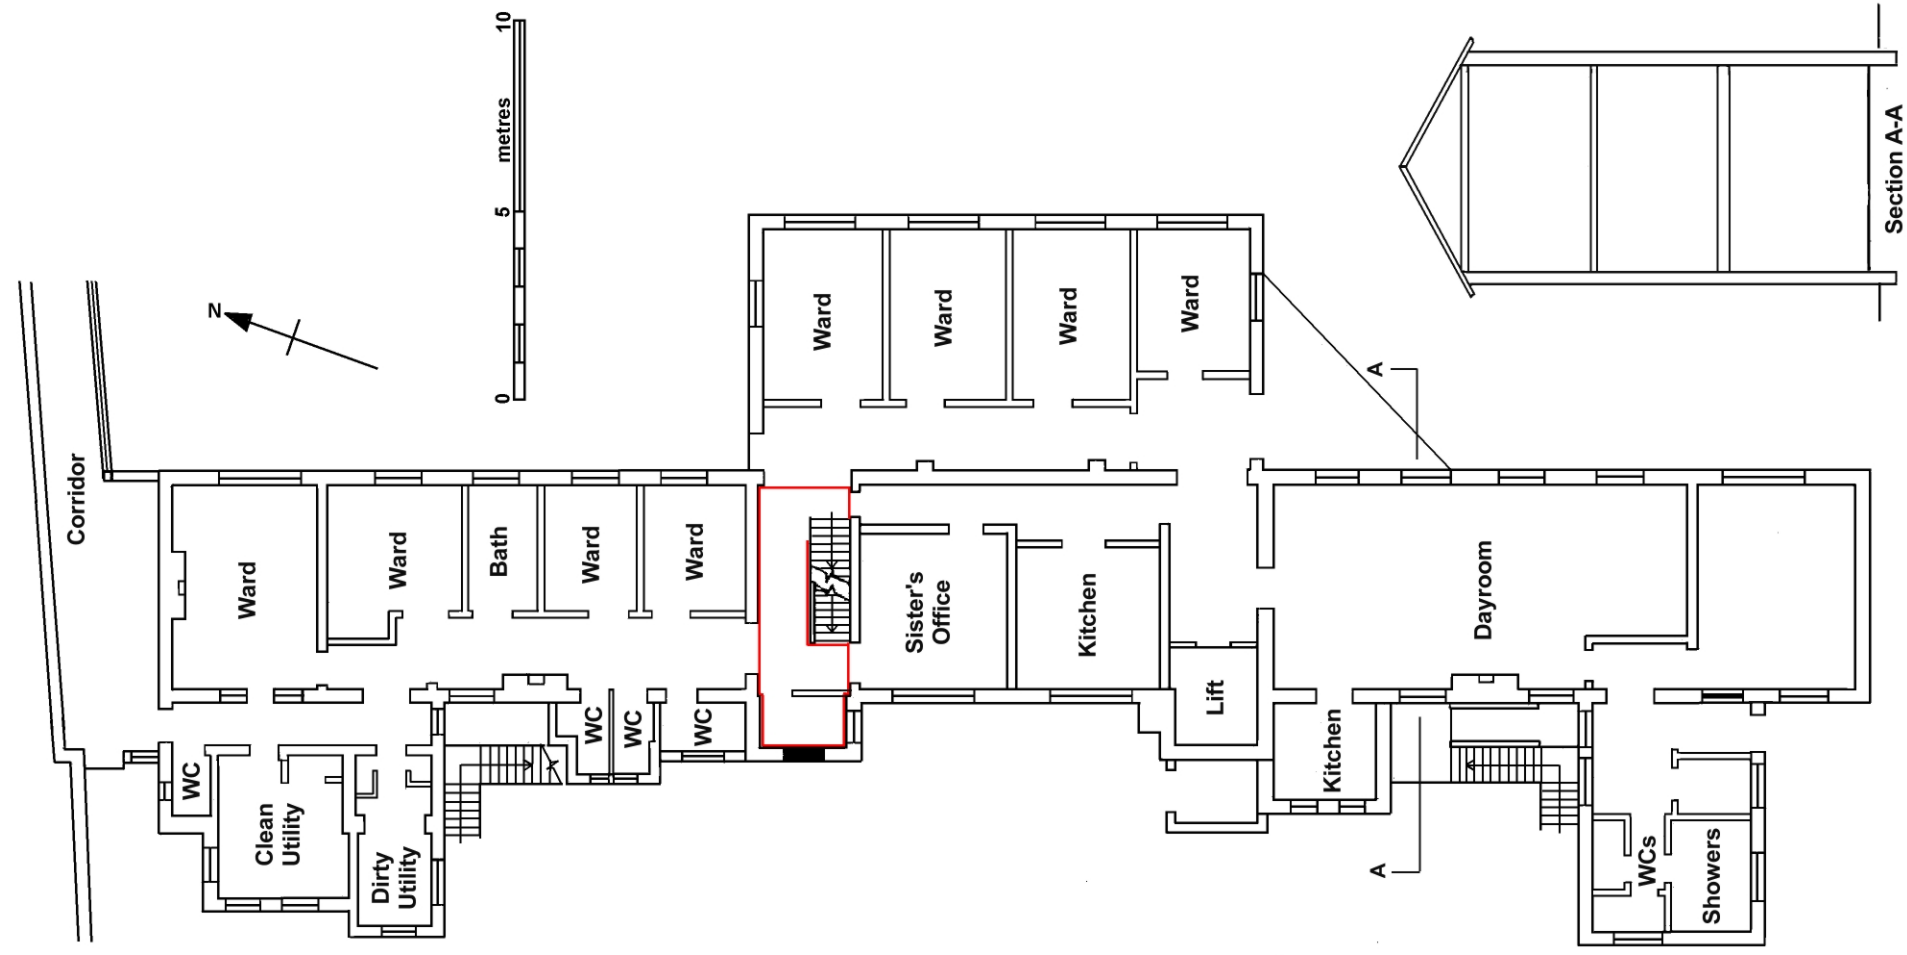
[05], cellar (shown in red) & ground floor plan & section
